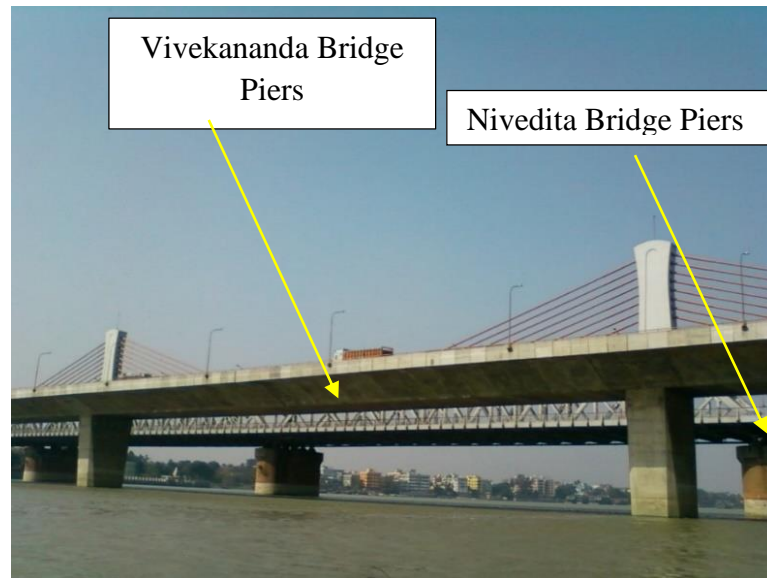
Two piers in tandem arrangement on the Vivekananda Bridge and Nivedita Bridge
